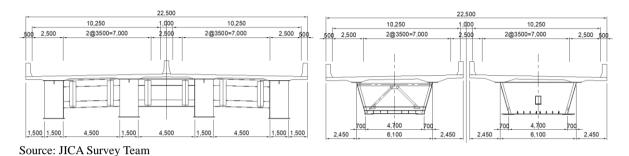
Cross Section of Long Span Bridge of Coastal Road
